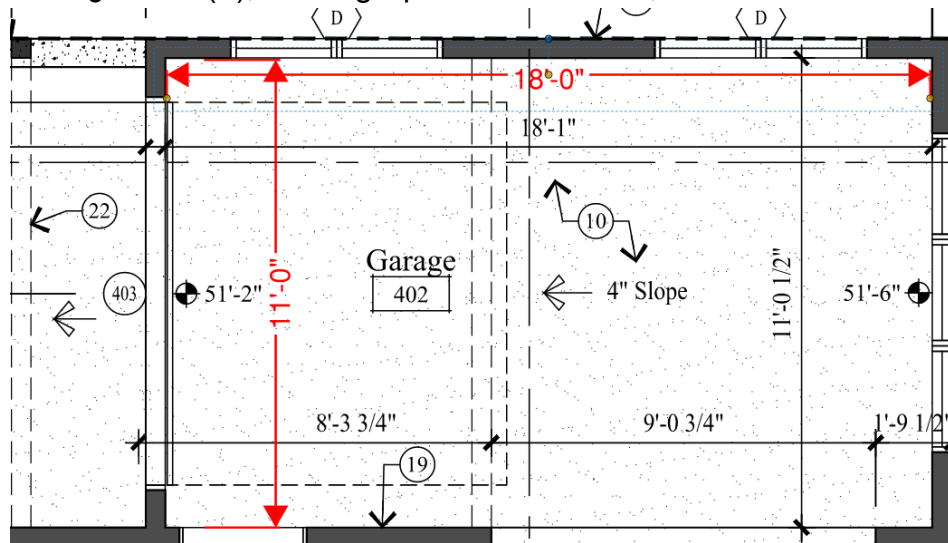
Excerpt from Applicant's plans with staff's measurements of the garage
